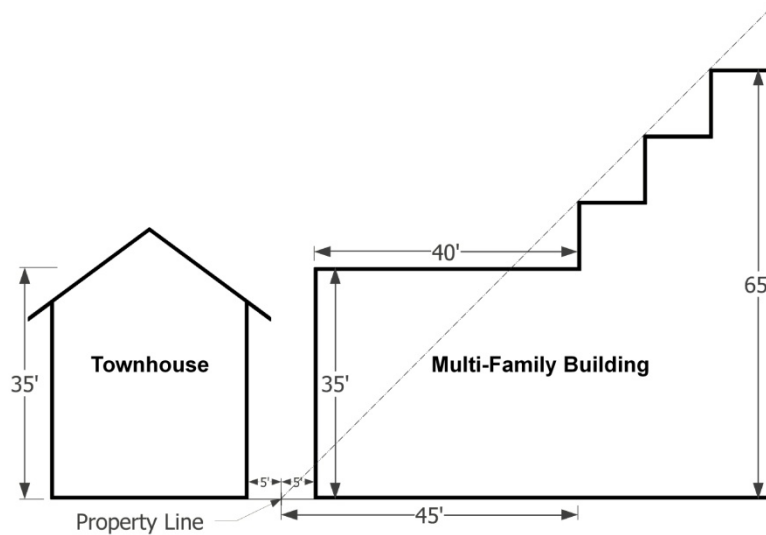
B Diagram showing example of height requirements and allowances for multi-family and mixed use projects abutting Townhouse Zone or townhouse properties.
